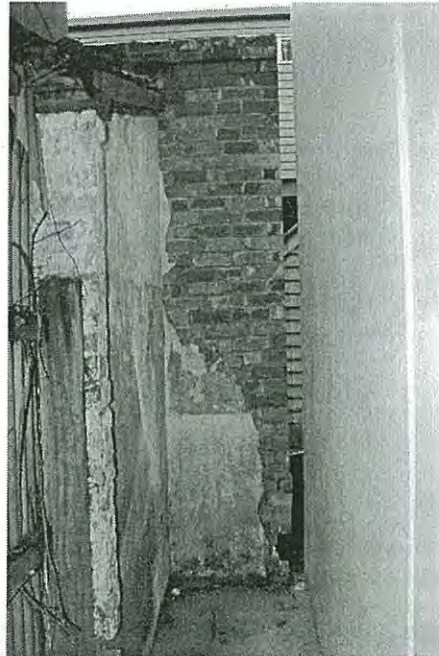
Interior, Men's Toilets (space T01). View showing area of demolished toilet cubicle (northern end of toilets). Note the damage to the west brick wall, introduced boundary wall of the new University of Ballarat building.
